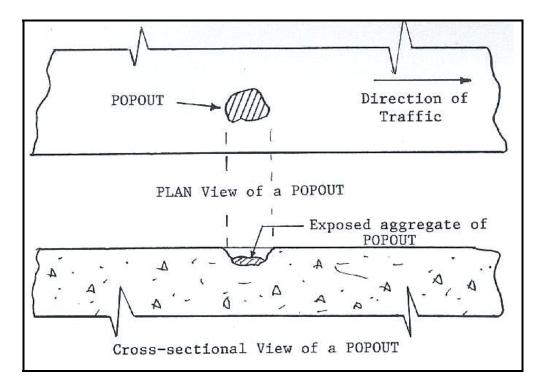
Popout in CRC Pavement, Plan and Cross-section Views
